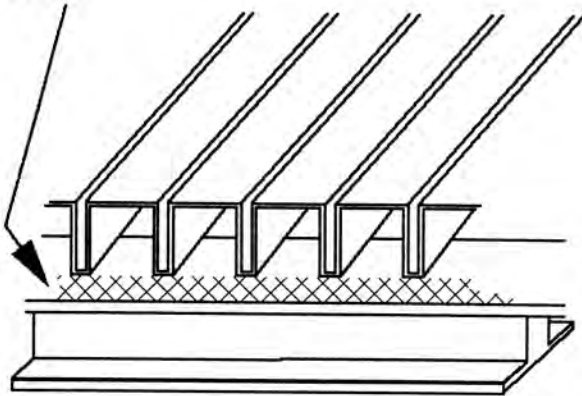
A potential for trapped contamination existed between the sheet metal roof decking and the structural steel.
